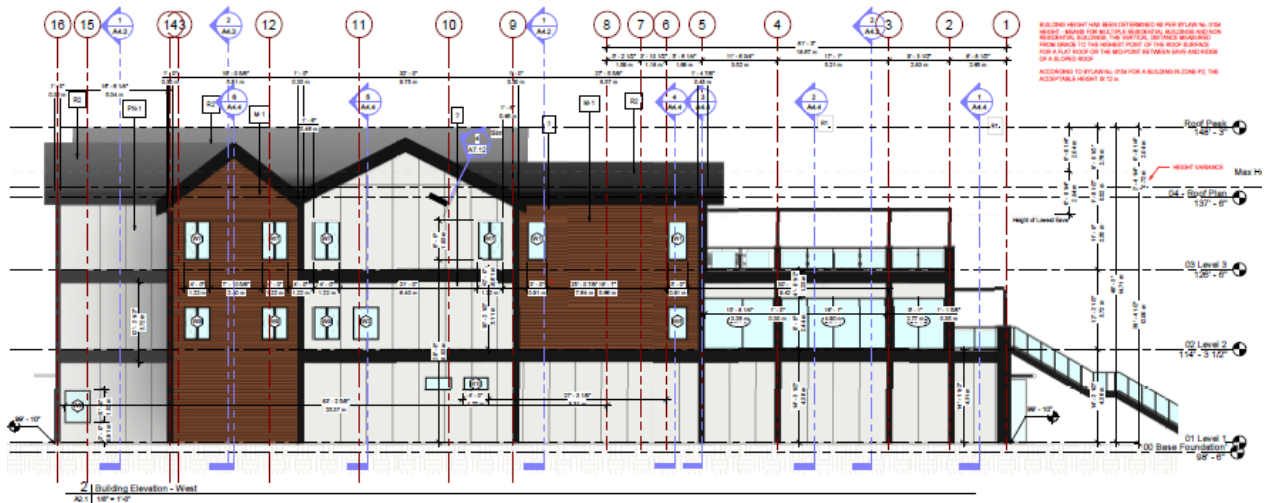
West Elevation (facing adjacent development, “The Waterfront”)
